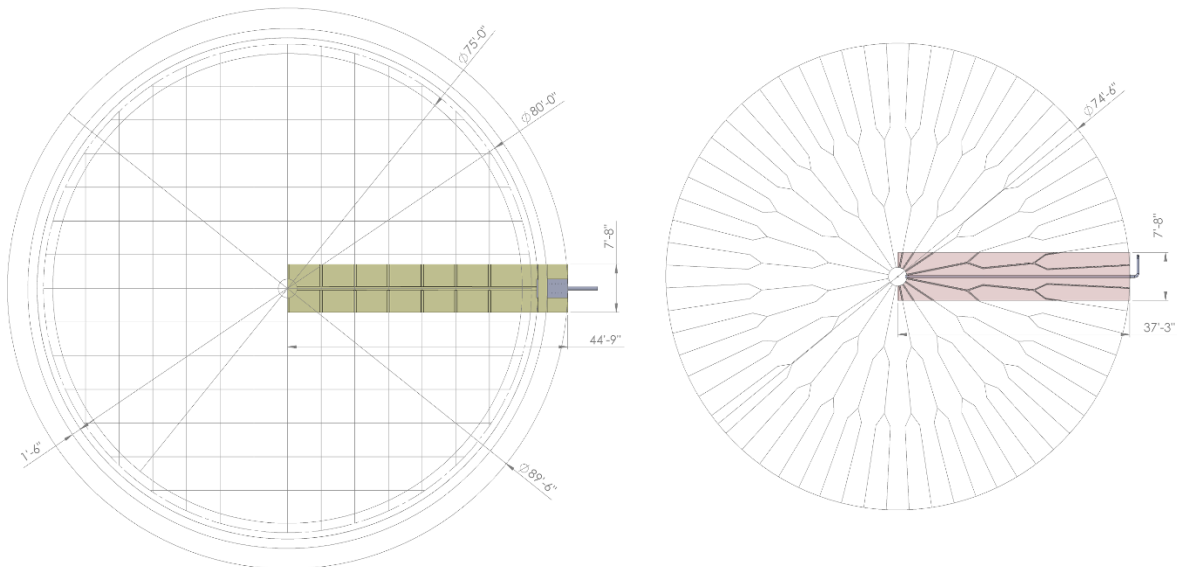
Layout of the tank foundation drains (left) and cooling channels (right).
